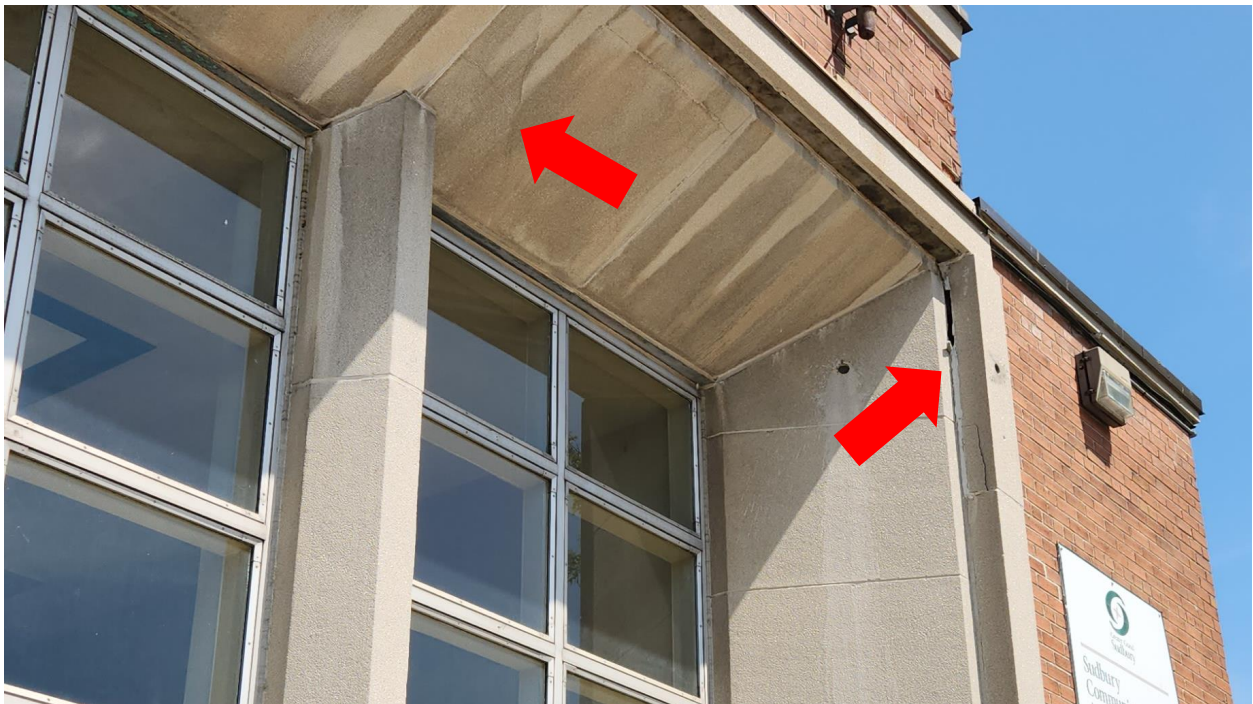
Cracked precast concrete at Main Entrance (c.1951).
